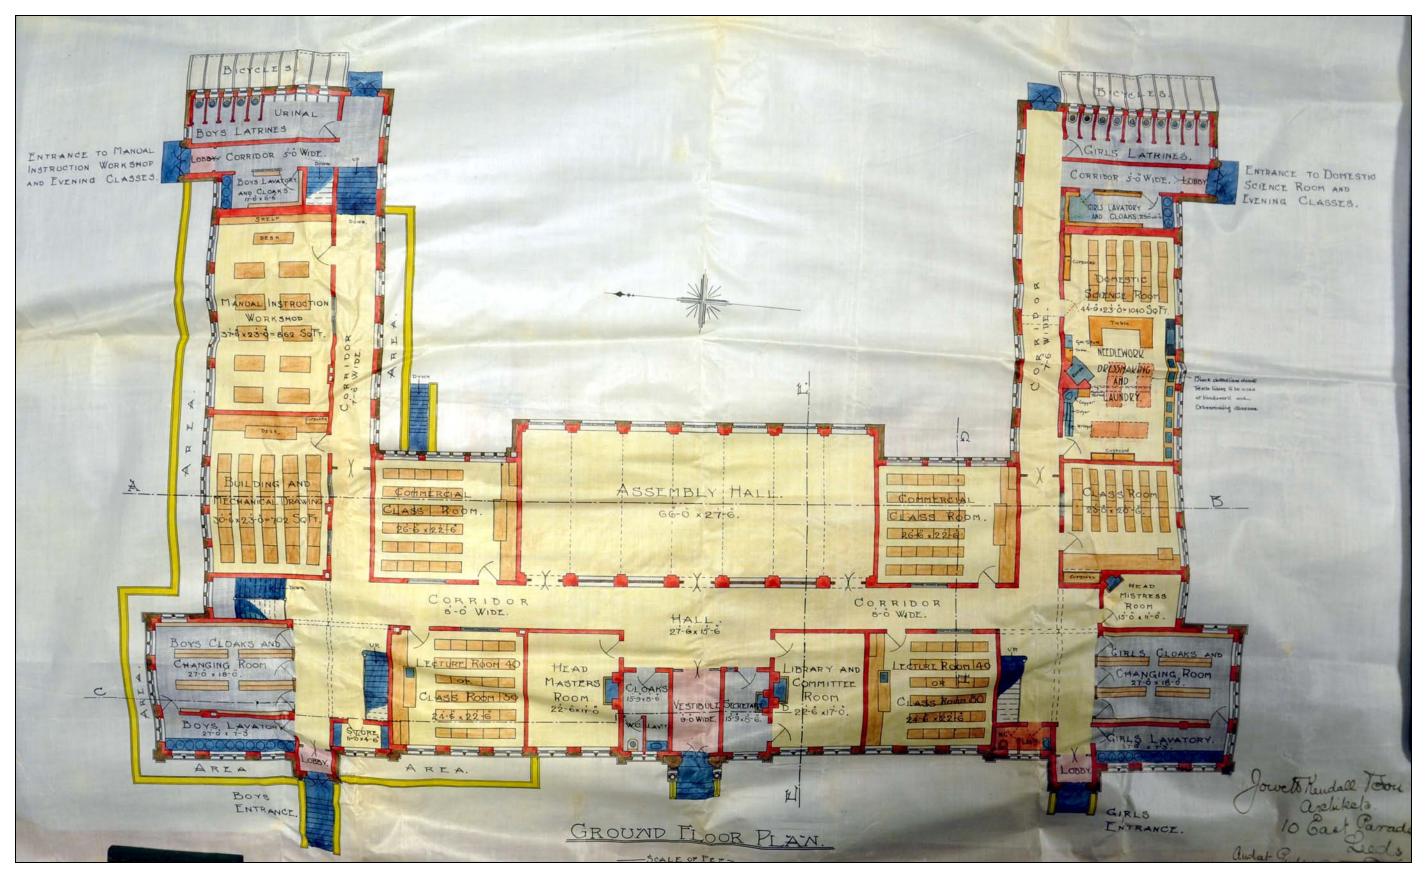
Kendall's ground floor plan, 1908 Reproduced by kind permission of West Yorkshire Archive Service Leeds, LMT/PU/P1588, plan no 1934
